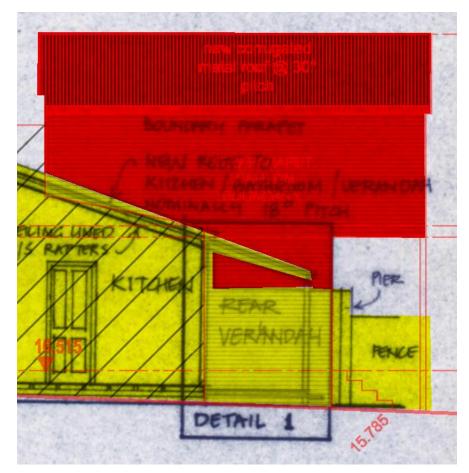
Yellow is the existing house at No. 39. Red is the proposed additions.
